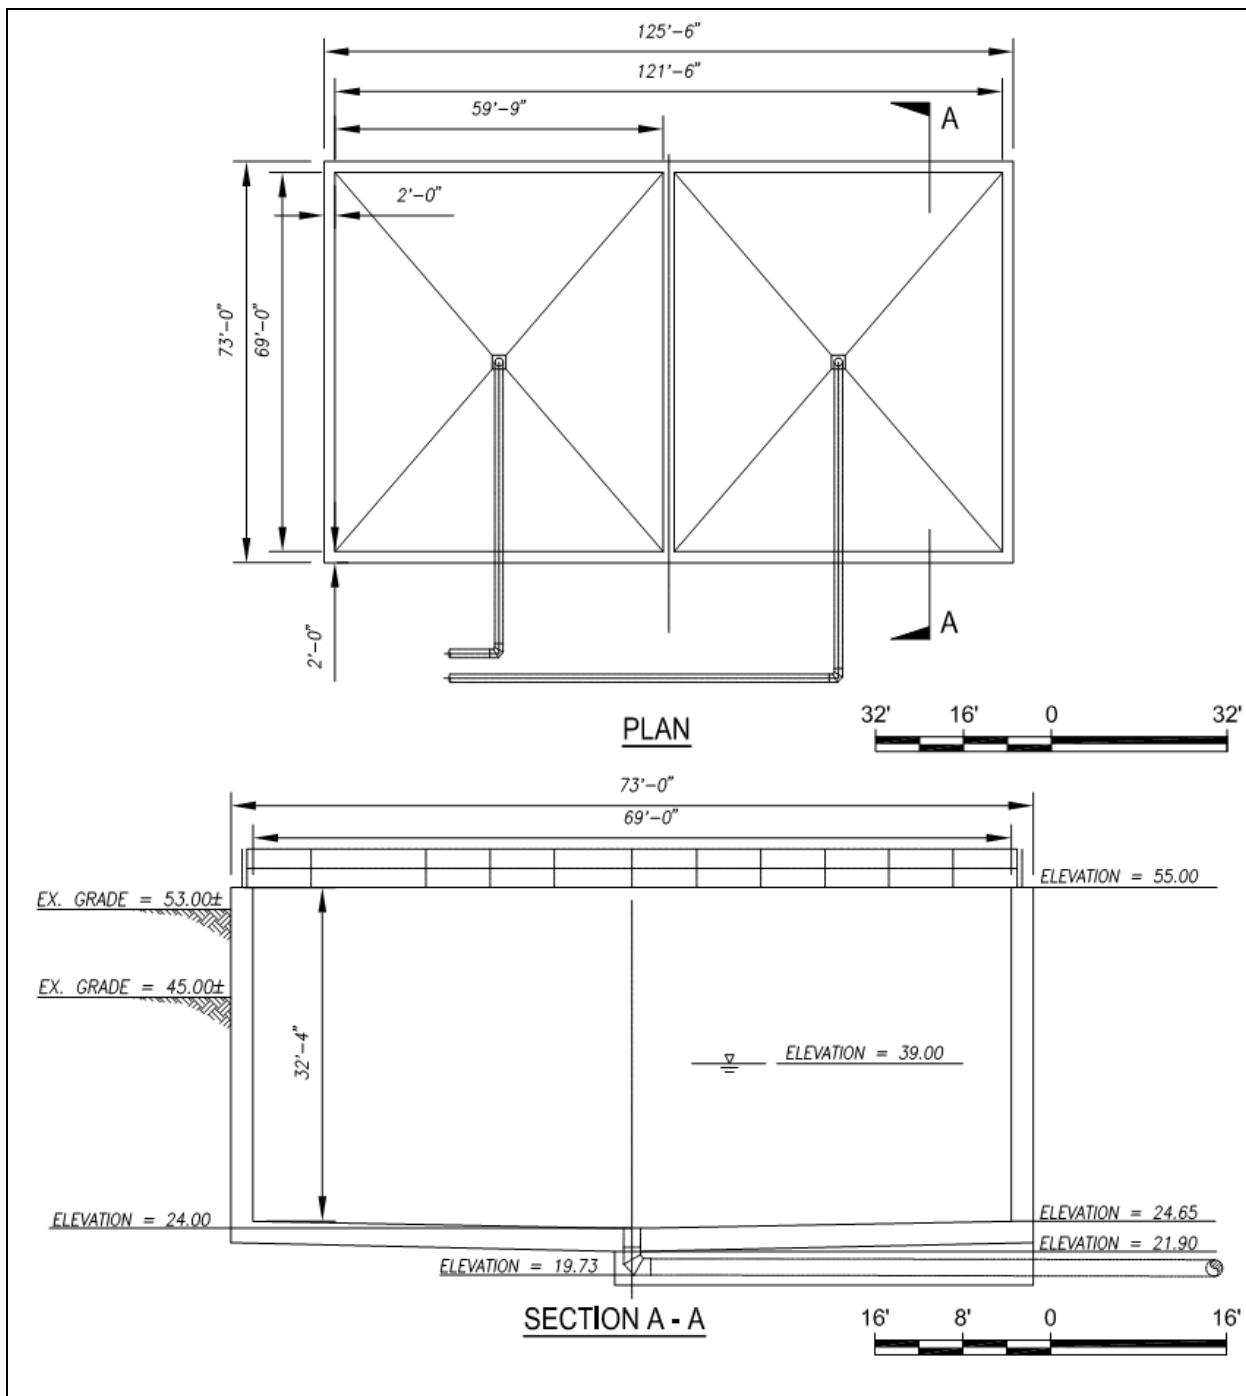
Option 3B: Plan and Section Views – 0.84 MG EQ Basin at Ex. Storage Tank
